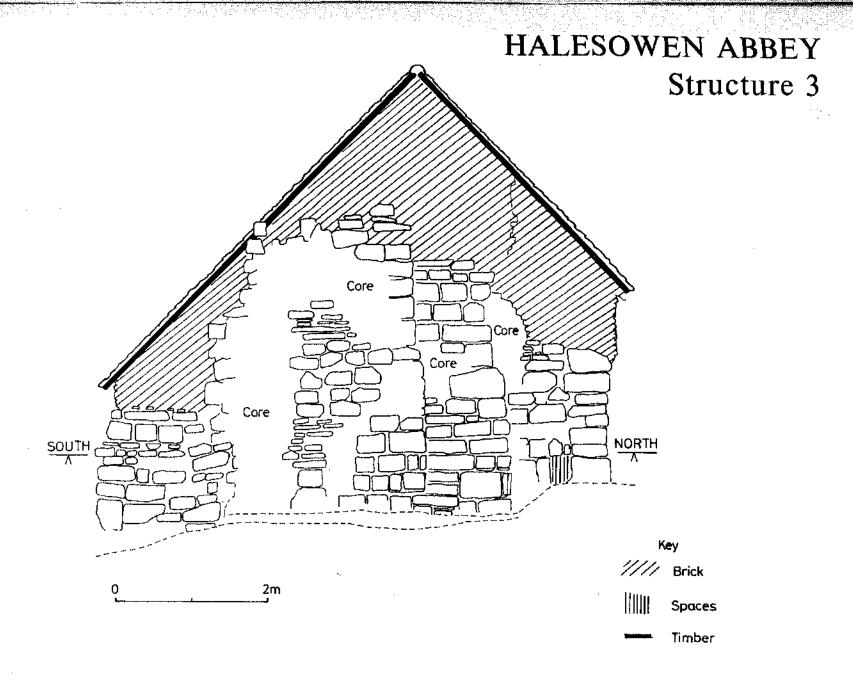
Structure 3. East Wall, Exterior Elevation. (Hooper)
